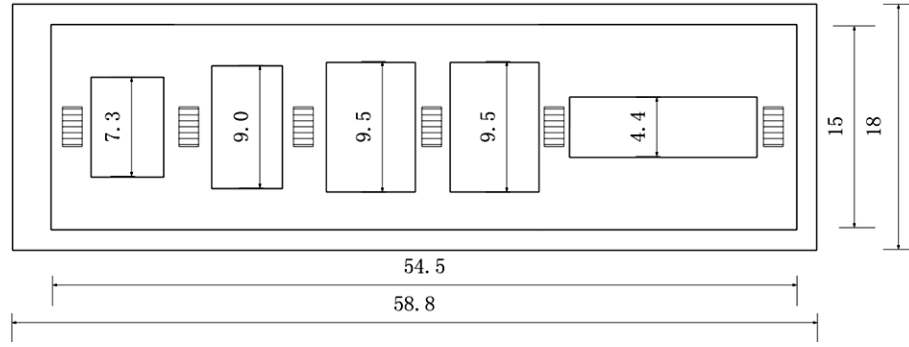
Plan view of the operating deck, columns and the foundation mat (unit:m)
